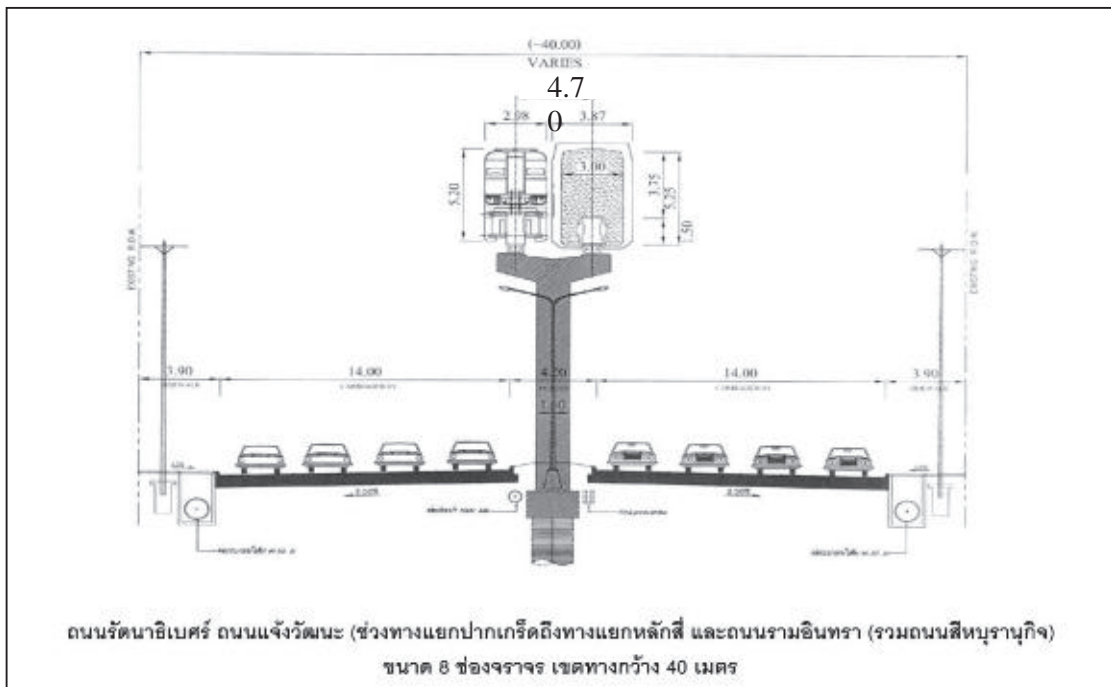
Traffic Condition after Completion of Construction on Rattanathibet Road, Chaeng Watthana Road and Ram Indra Road to Sihaburanukit Road
